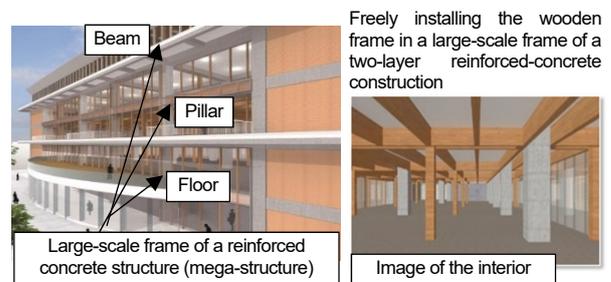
Example of the prototypes of frame form in mixed structure architecture
